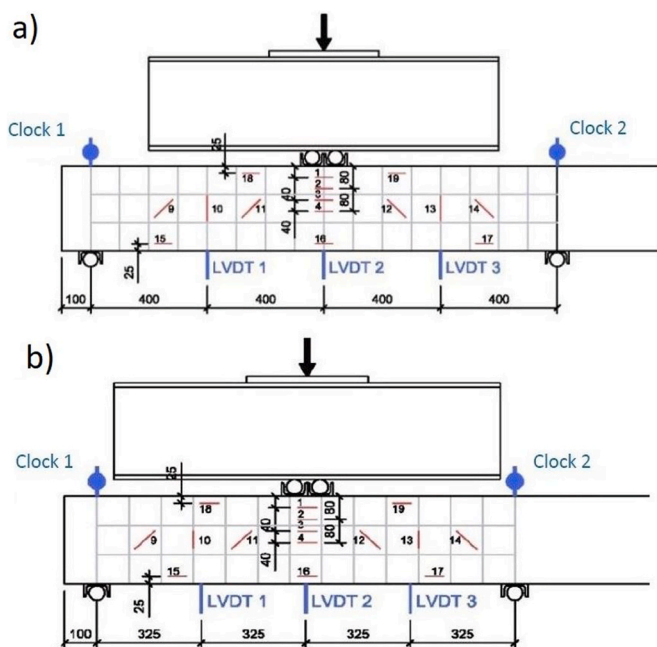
Shear test setup for beams: a) Batch 1 beams; b) Batch 2 beams.
